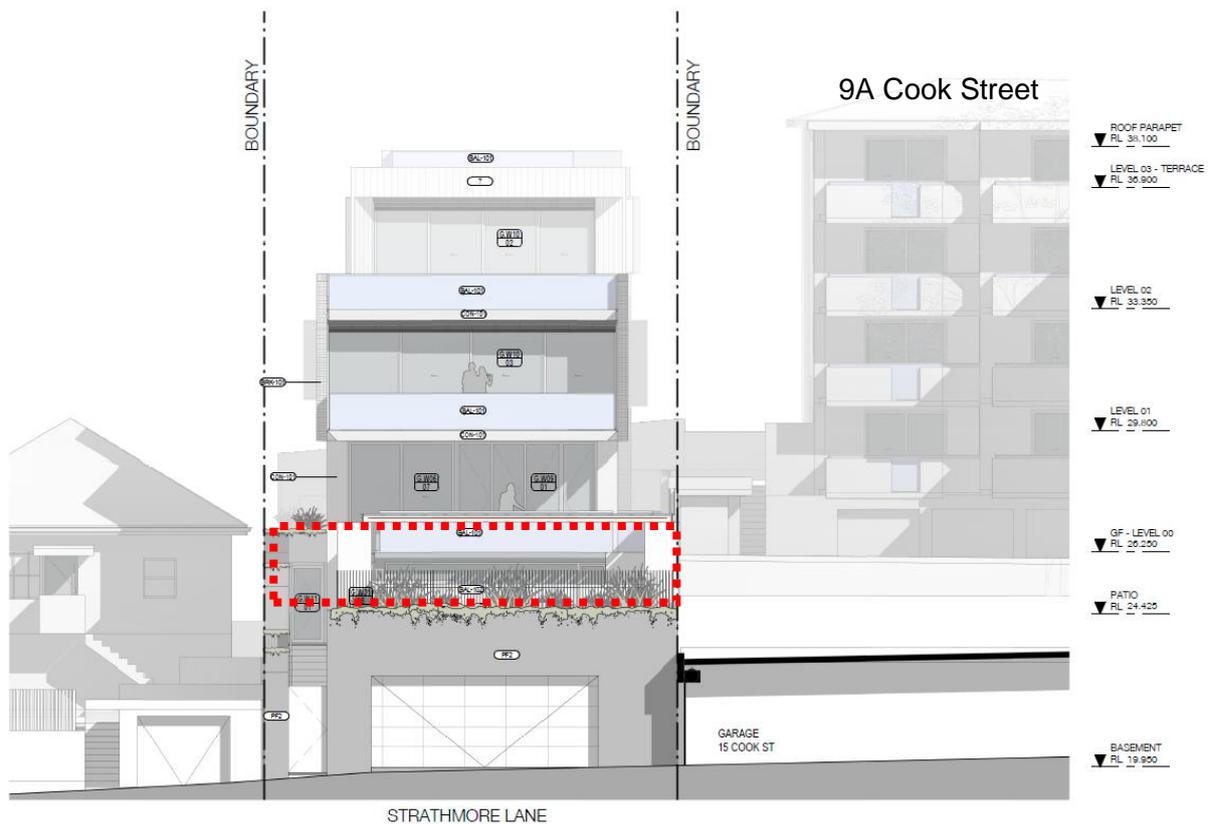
Proposed Strathmore Lane elevation depicting the partial additional storey. Note: the ground floor windows of the closest apartment within 9A Cook Street sits above the lower ground floor level of the subject site.
